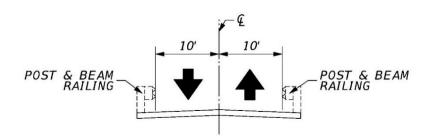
Existing 2-Lane Bridge Typical Section (Oil Well Road Over Faka Union Canal) (Randall Boulevard over Golden Gate Main Canal) (Randall Boulevard over Faka Union Canal)
